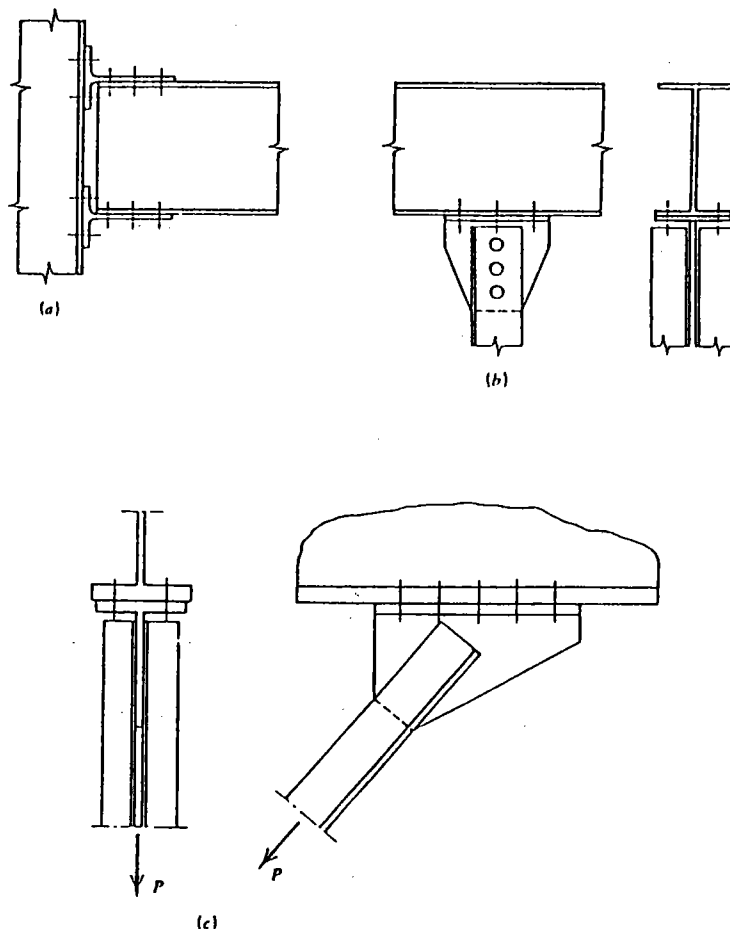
Typical uses of T-type structural connections. (a) Beam-to-column connection. (b) Hanger connection. (c) Diagonal brace connection.
